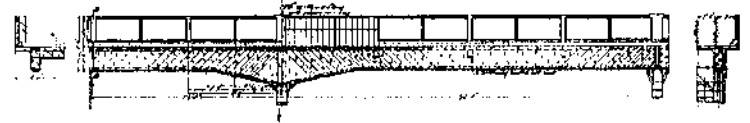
Longitudinal Section of Concrete Girder Showing Reinforcement.
